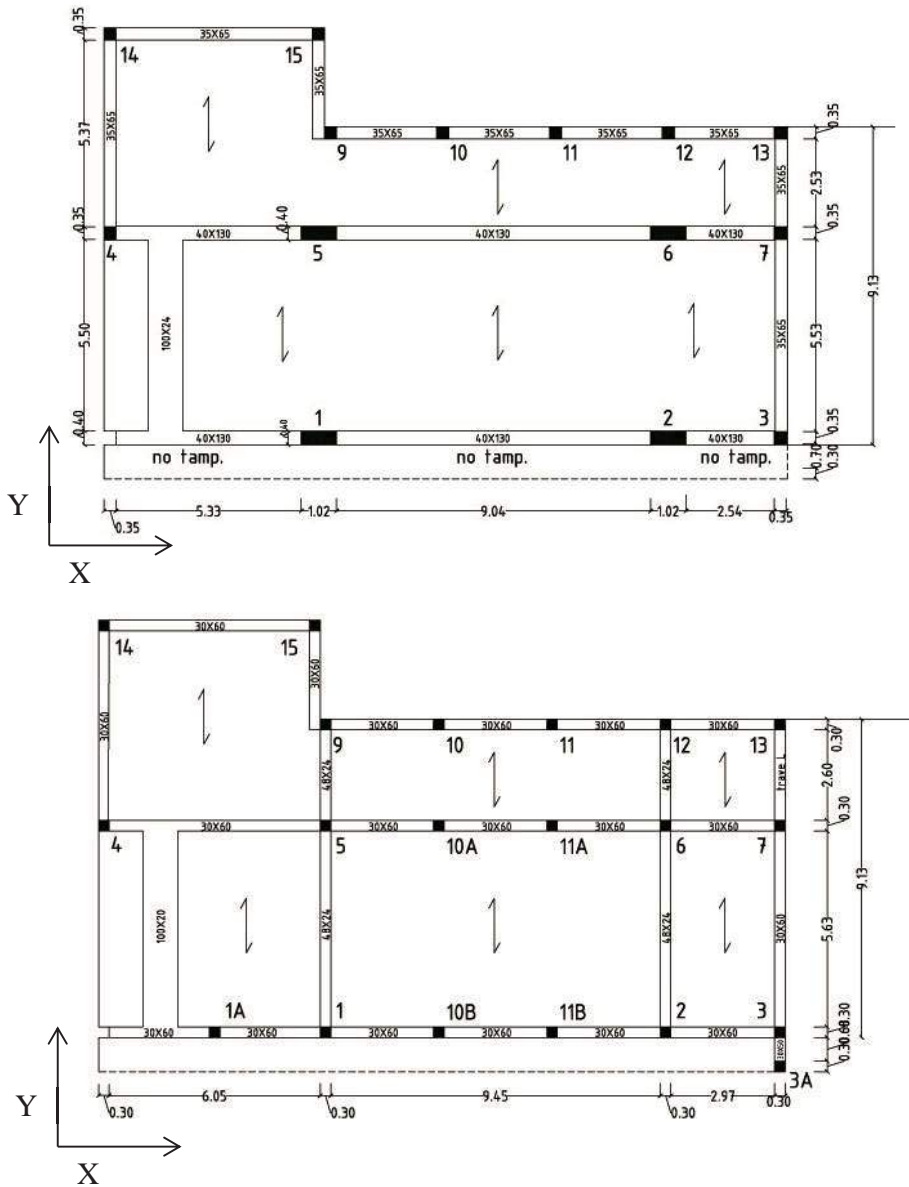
6 Plan overviews of the ground and first floor of the emergency department (ED).
